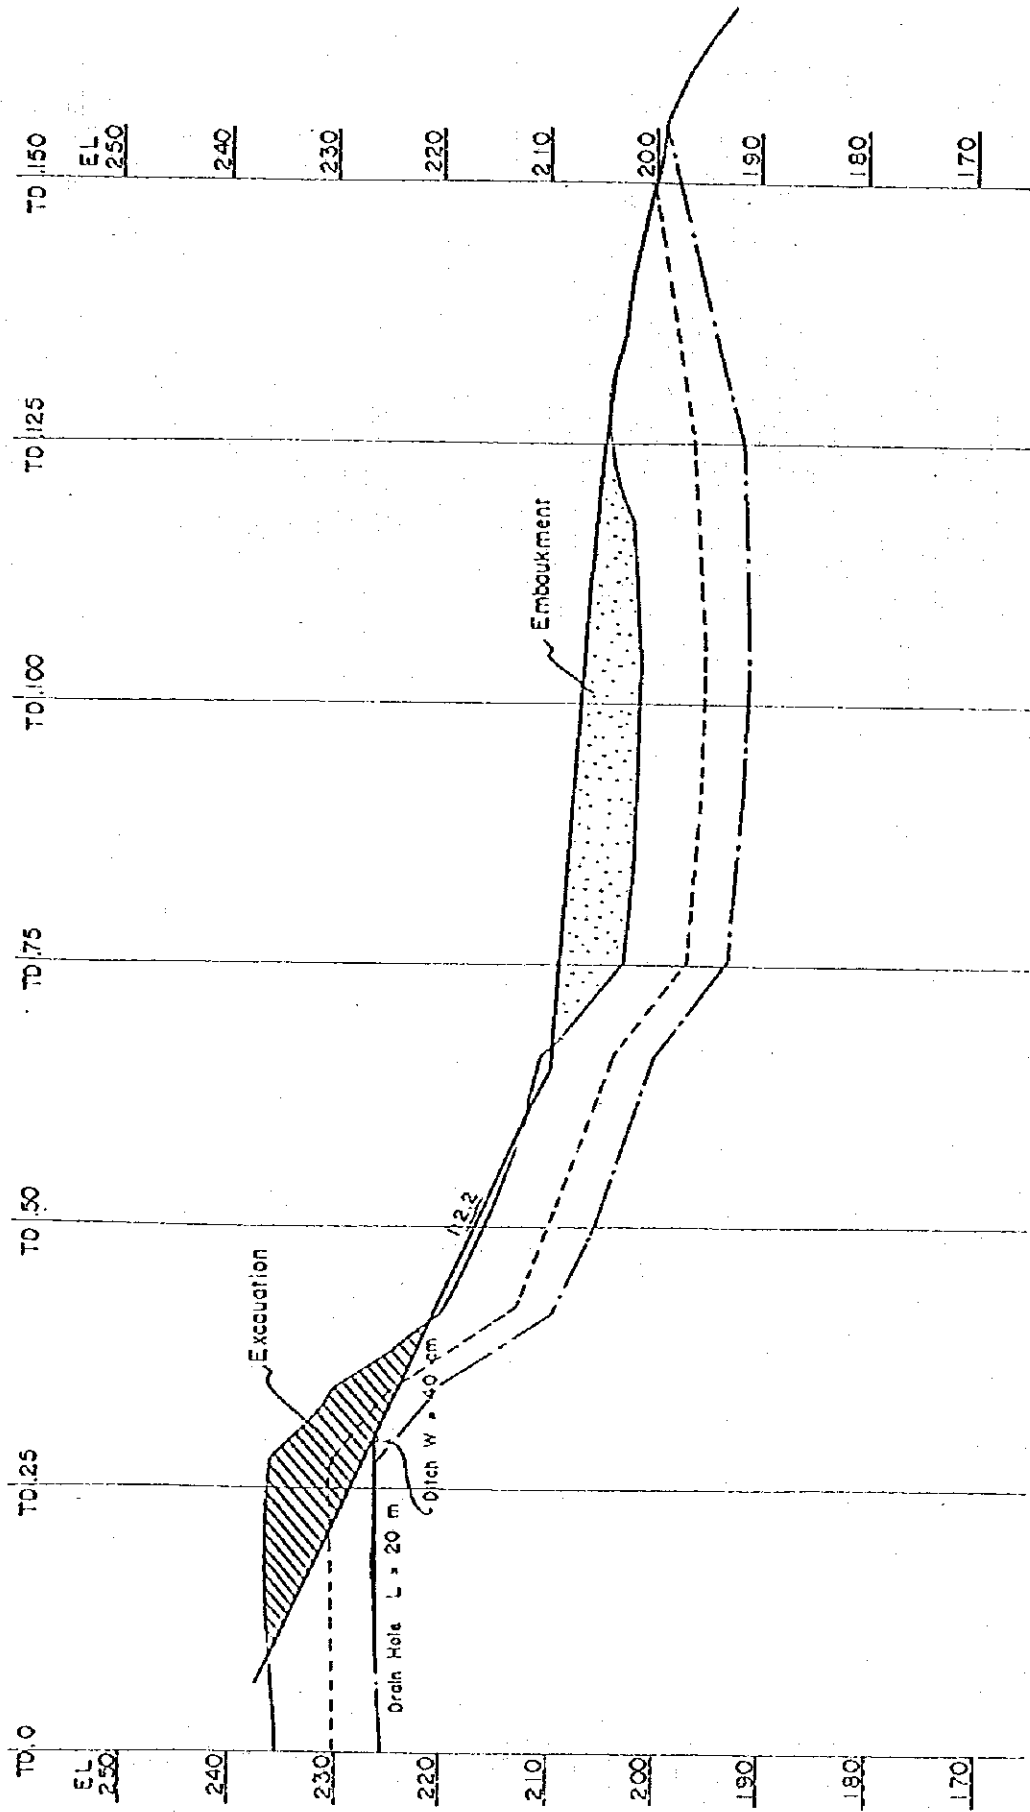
Longitudinal Profile after Slope Reformation (Cross Section B-B)
